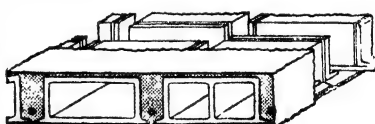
Dentile Floor (Reinforced in two Directions).
